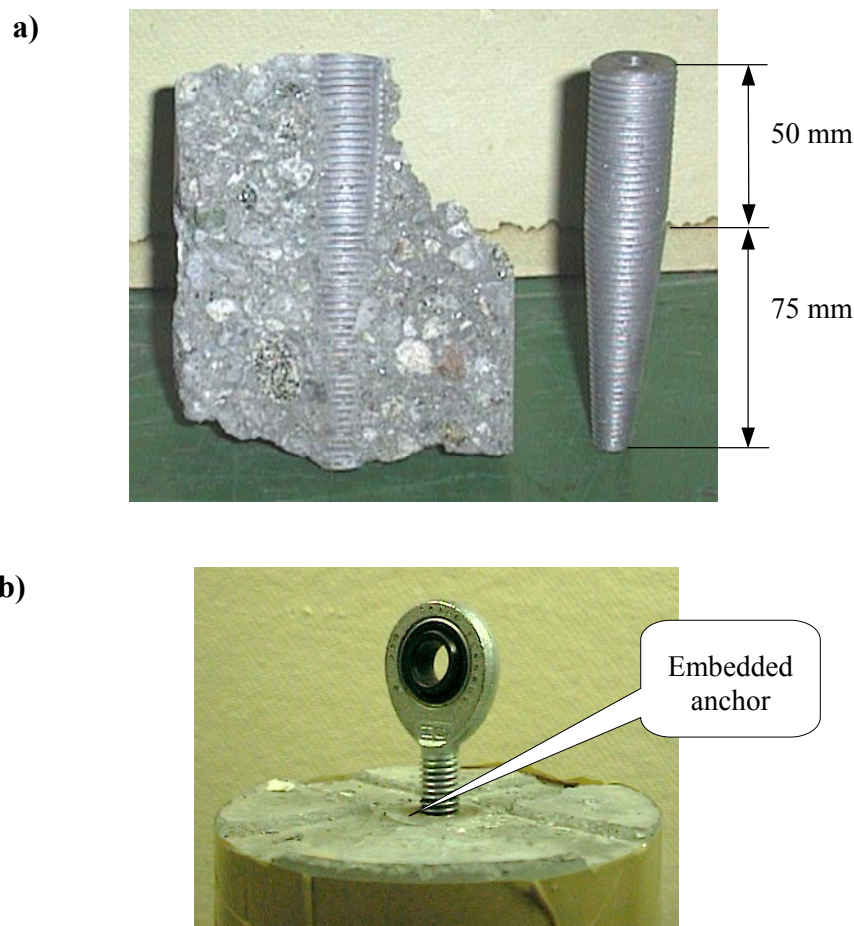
The ends of a concrete specimen. a) Anchor embedded in the end of the specimen, b) Hinge for transmission of load.
